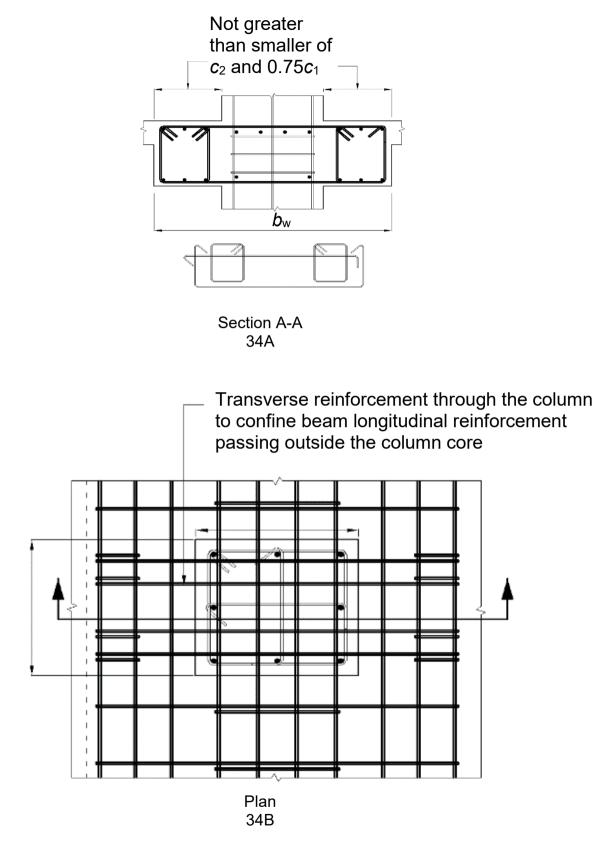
MAXIMUM EFFECTIVE WIDTH OF WIDE BEAM AND REQUIRED TRANSVERSE REINFORCEMENT
